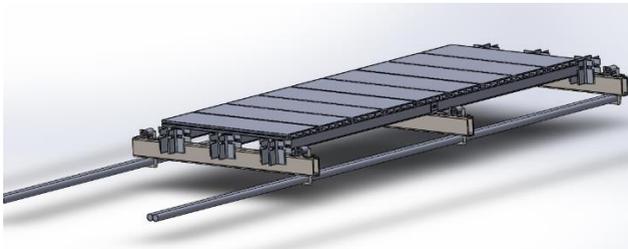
2 m. Prefabricated pedestrian bridge module
